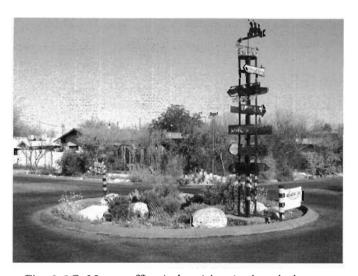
C. New traffic circle with raised curb, but no curb cuts. Used where center of road or intersection is raised or crowned to drain water to side of road. Raised curb (and sunken, mulched basin within) retain rainfall that would otherwise run off. Note: The construction of this circle reduced the paved area of the intersection by 26%!
